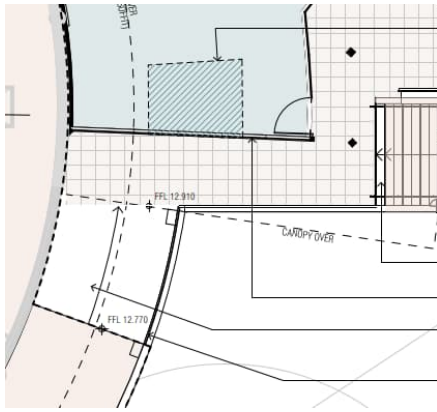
Extract of TP101, showing the proposed ramp, and extent of proposed handrail. Source: FK, 2024.
